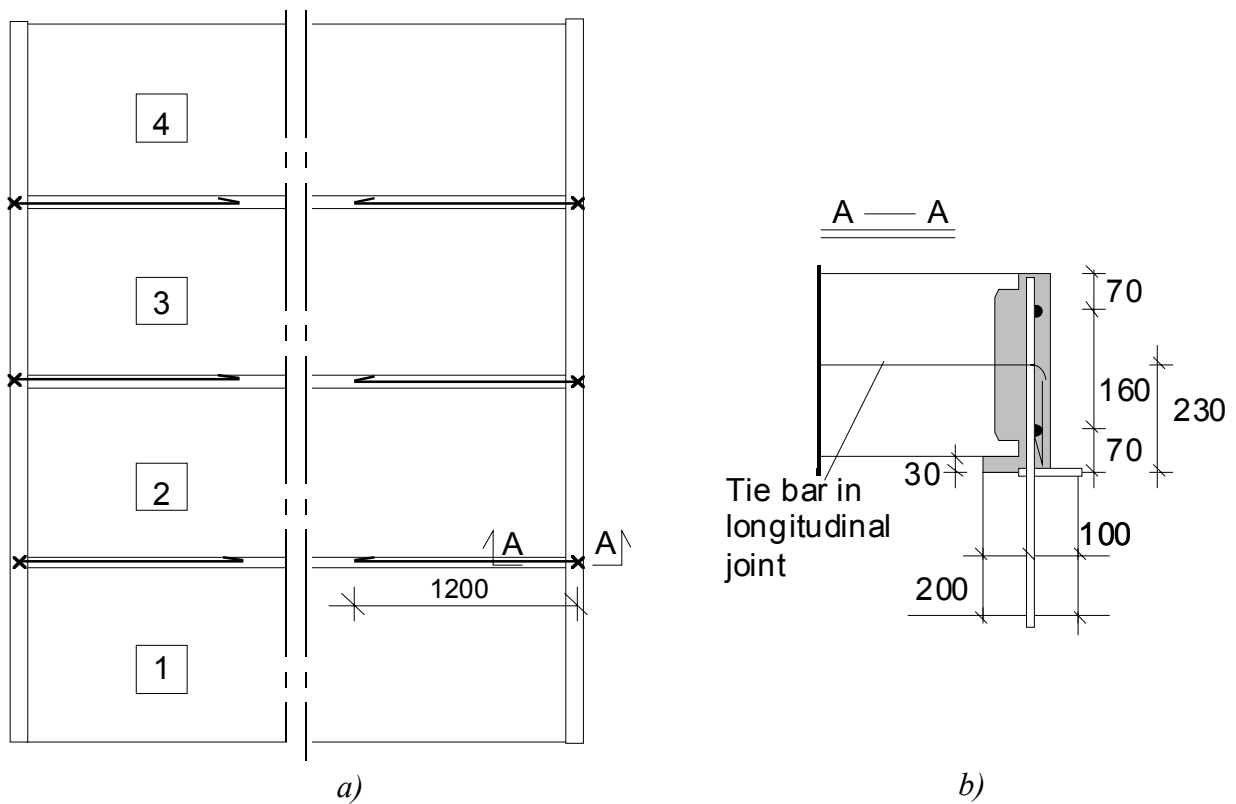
Tie reinforcement in longitudinal joints. a) Plan. b) Elevation.
